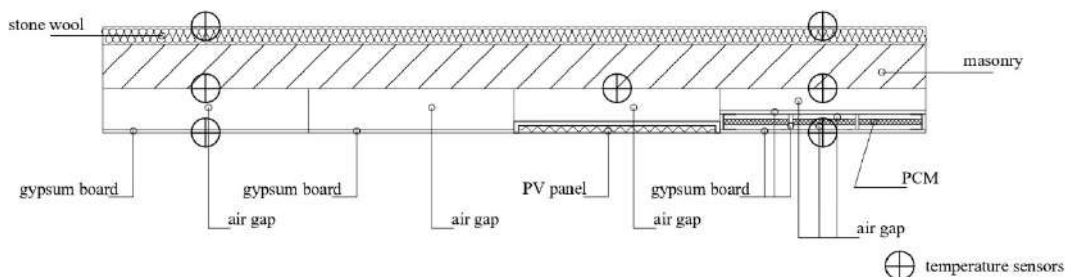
Floor plan of the under evaluation ventilated façade construction.
